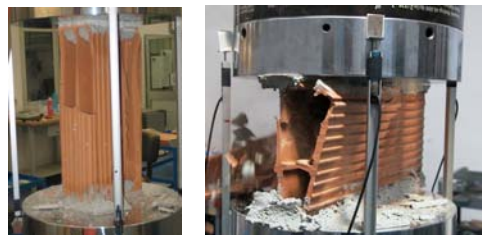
failure of a hollow brick sample compression orthogonal to holes (left); compression parallel to holes (right)
